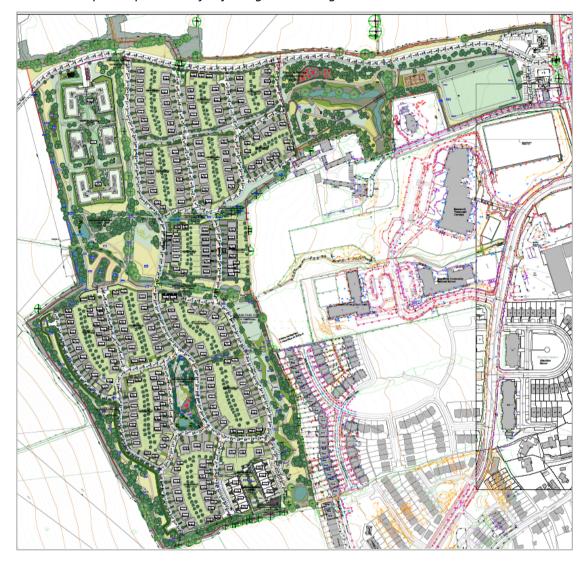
Development layout submitted to An Bord Pleanála (Source: MCORM Architects)
